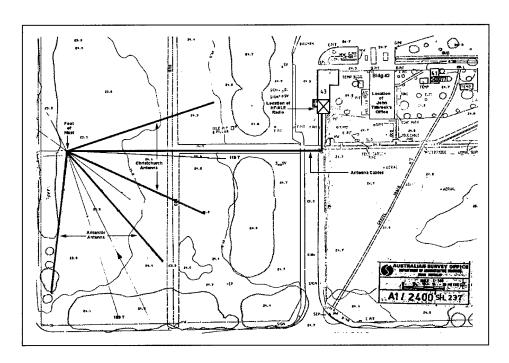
Site Plan for the DSTO HF/ALE Installation
